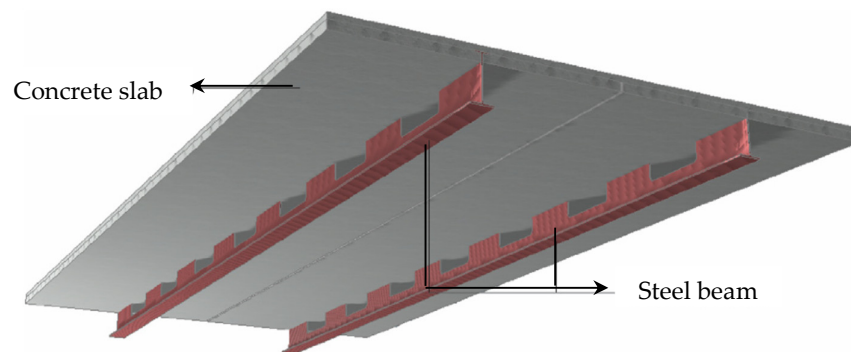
Steel–concrete composite floorings [186]. Reprinted with permission from Elsevier [186].
